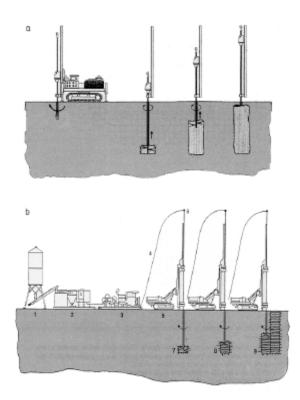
Stages of conducting jet-grouting method (a) as well as set of the equipment used (b):
